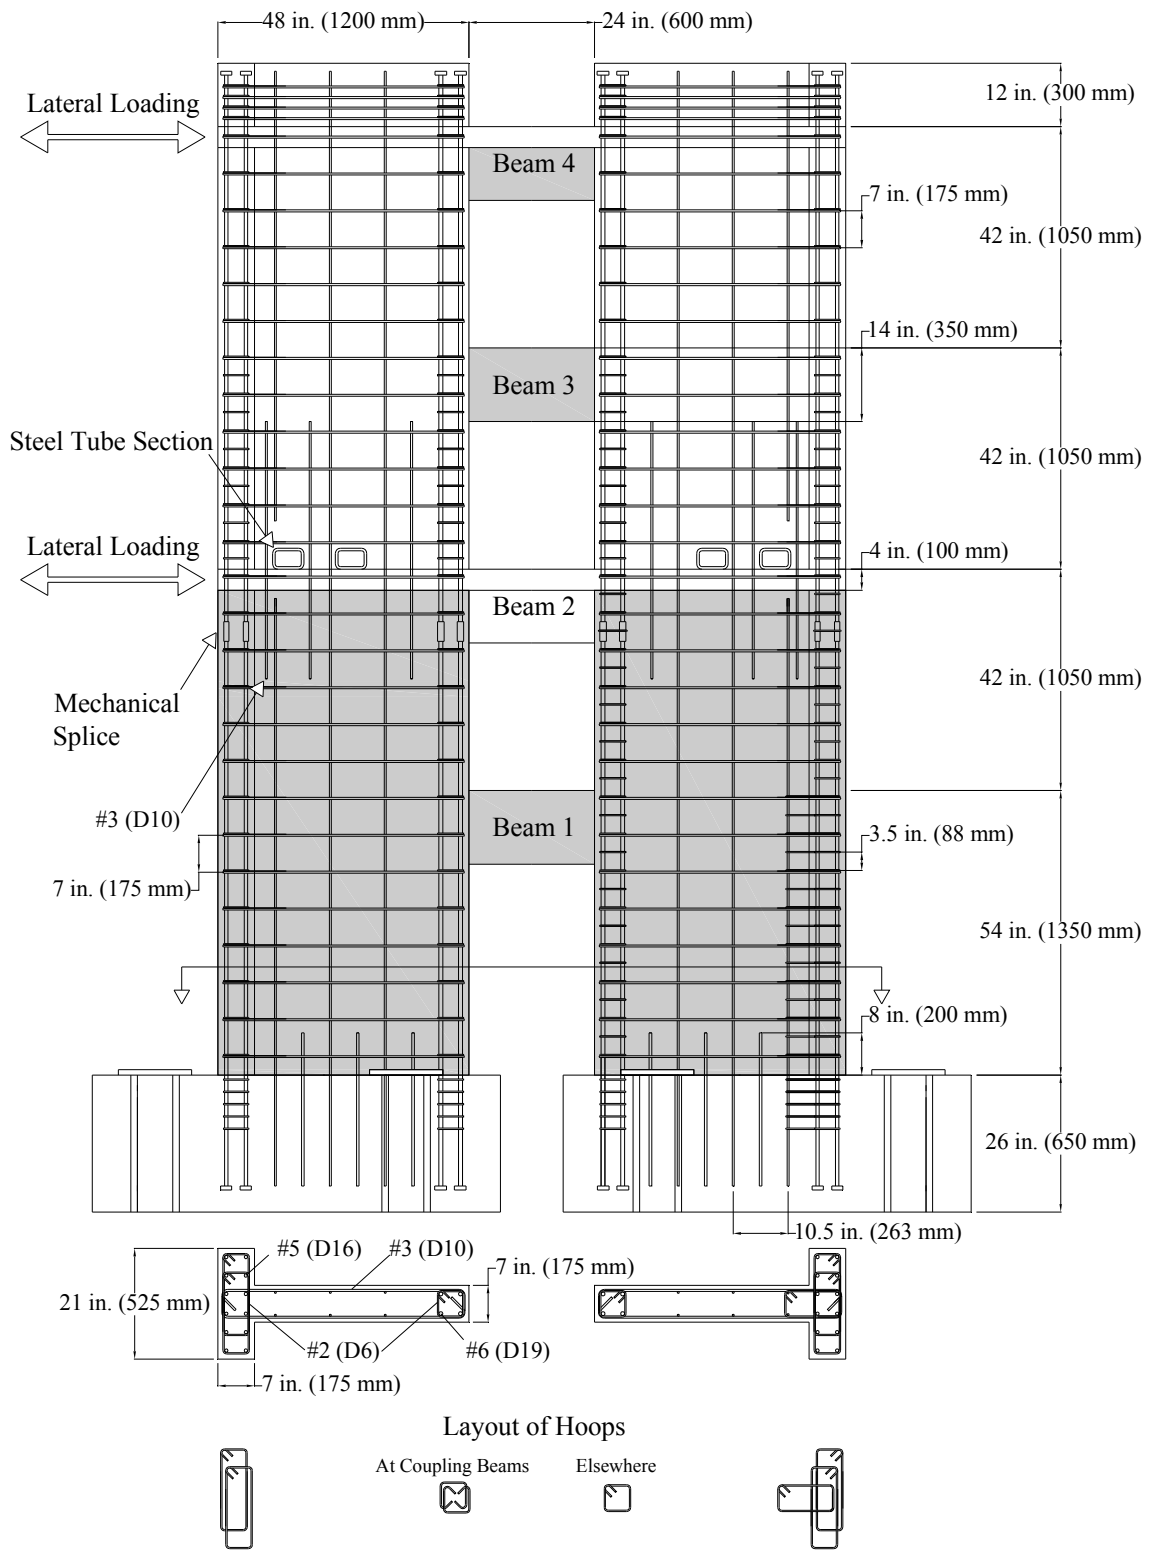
Specimen CW-2 reinforcement layout (shaded region is HPFRC)
